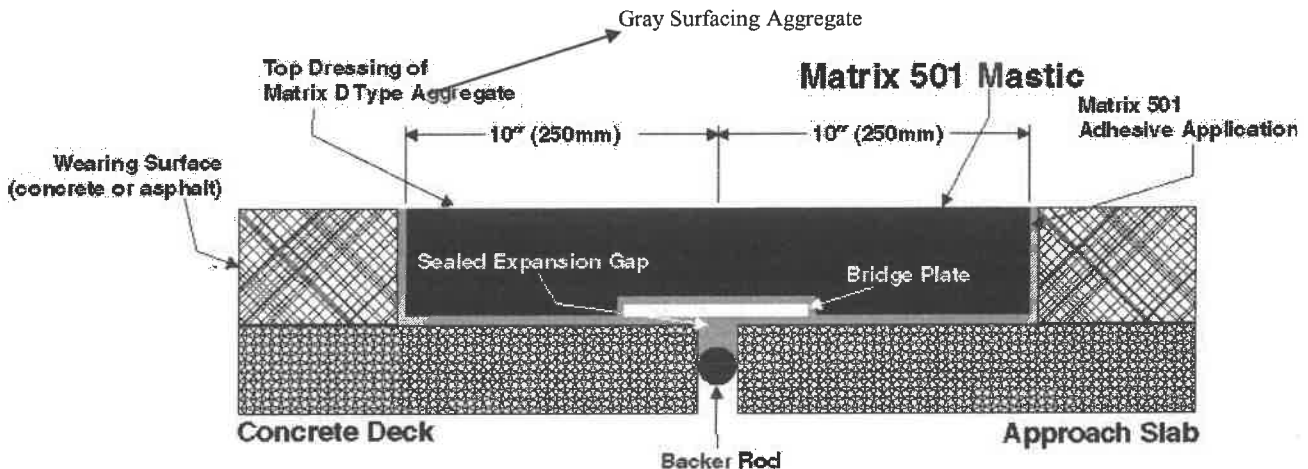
Typical Matrix 501 Asphaltic Plug Bridge Joint System Installation
